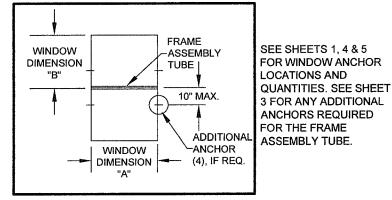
FIGURE FOR HORIZONTAL FRAME ASSEMBLY TUBE
